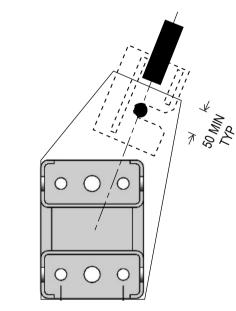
DETAIL J - EXISTING BASEMENT COLUMN TO C1(SYS15) PROP CONNECTION - PLAN NTS
